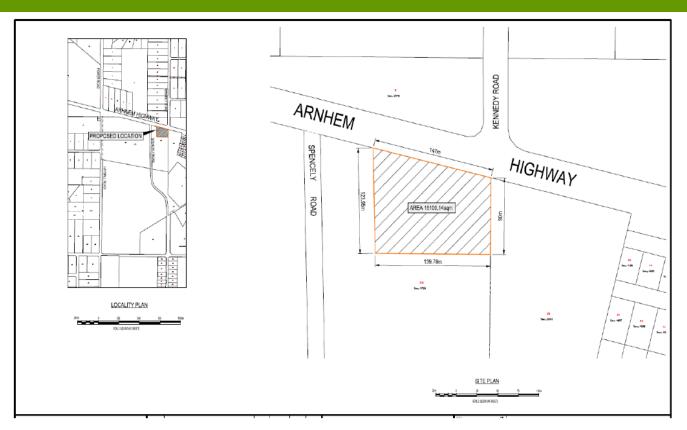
Proposed land for new ground level tank (provided by PWC)
